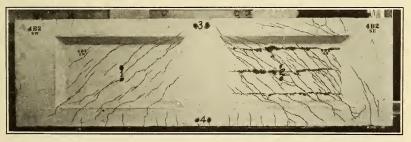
Failure by horizontal shear of beam 4B2 having vertical and horizontal web reinforcement
